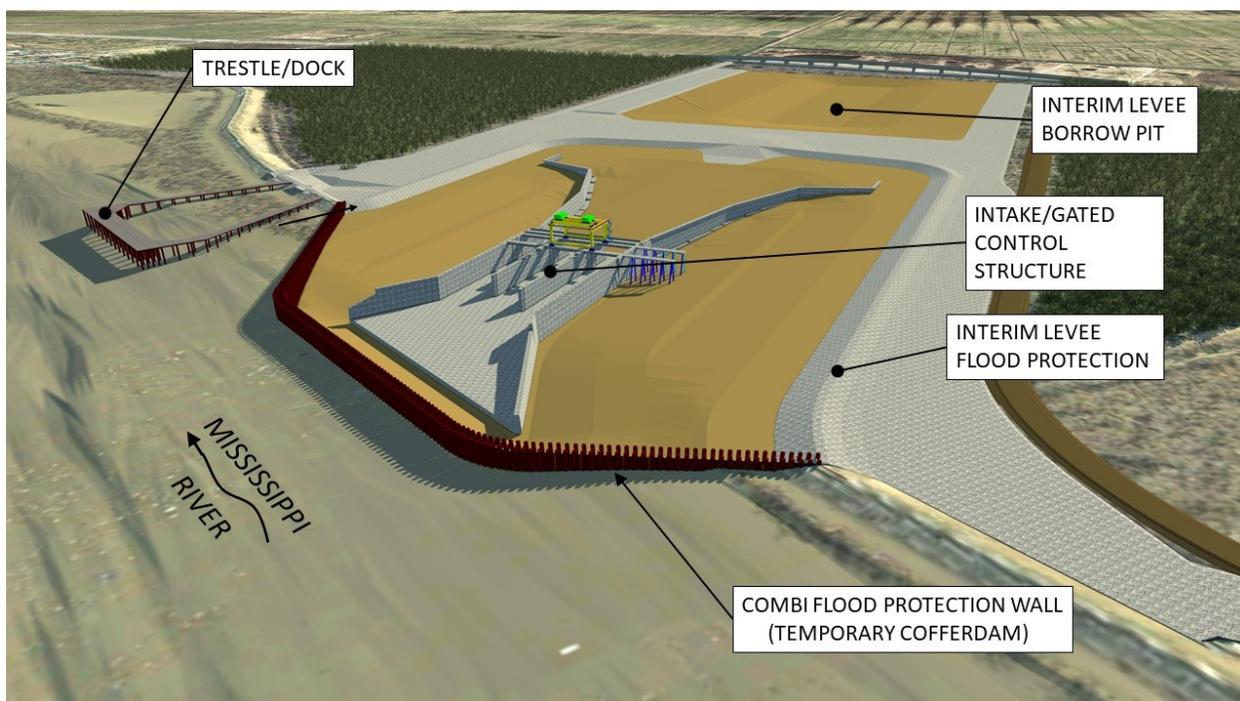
Proposed Temporary Cofferdam and Trestle/Dock as Viewed from the Mississippi River.
